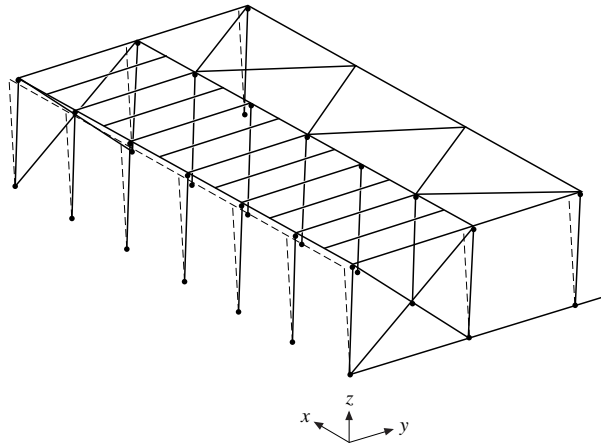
Transfer of P- Δ forces from inclined columns through roof and wall bracing. (STEP 1995 Article D9)
